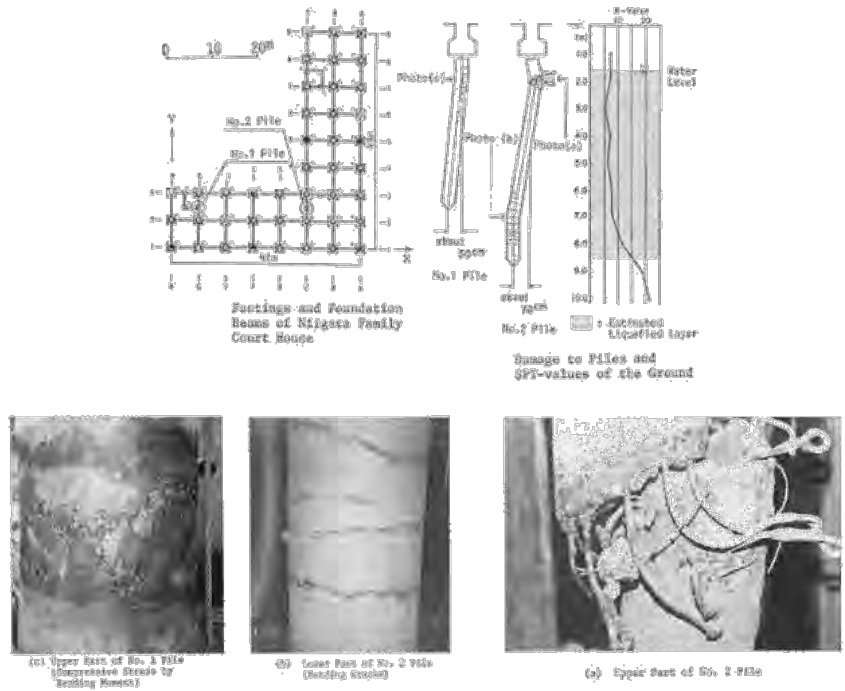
Damage to Excavated Pile from the Niigata Court House (Hamada and O'Rourke, 1992)
